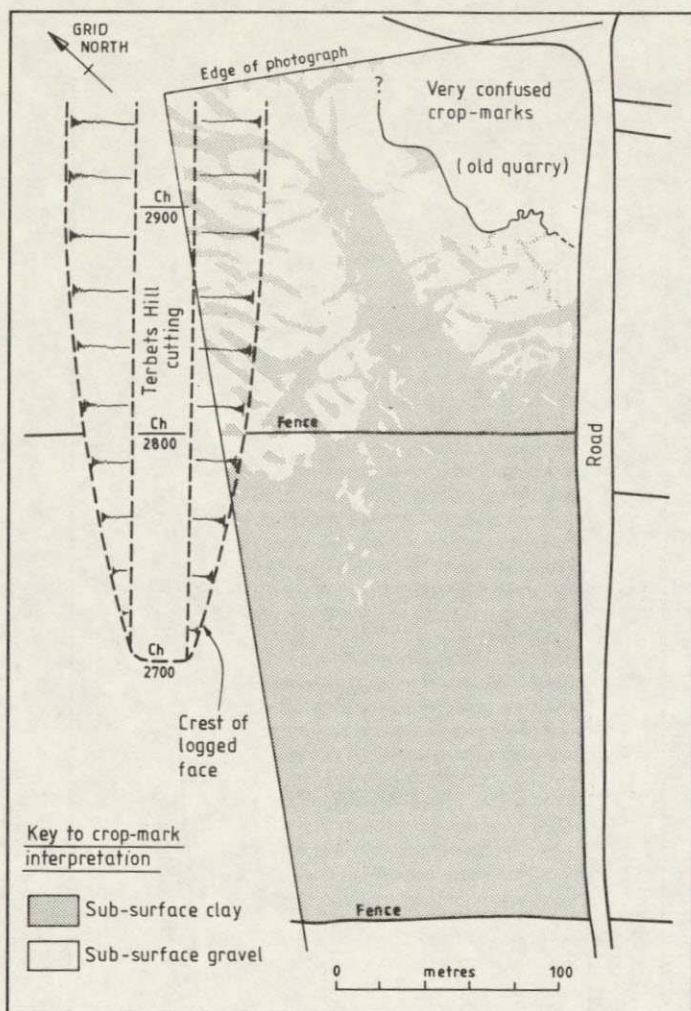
Stanstead Abbots: Site plan showing crop-marks visible on aerial photograph.
